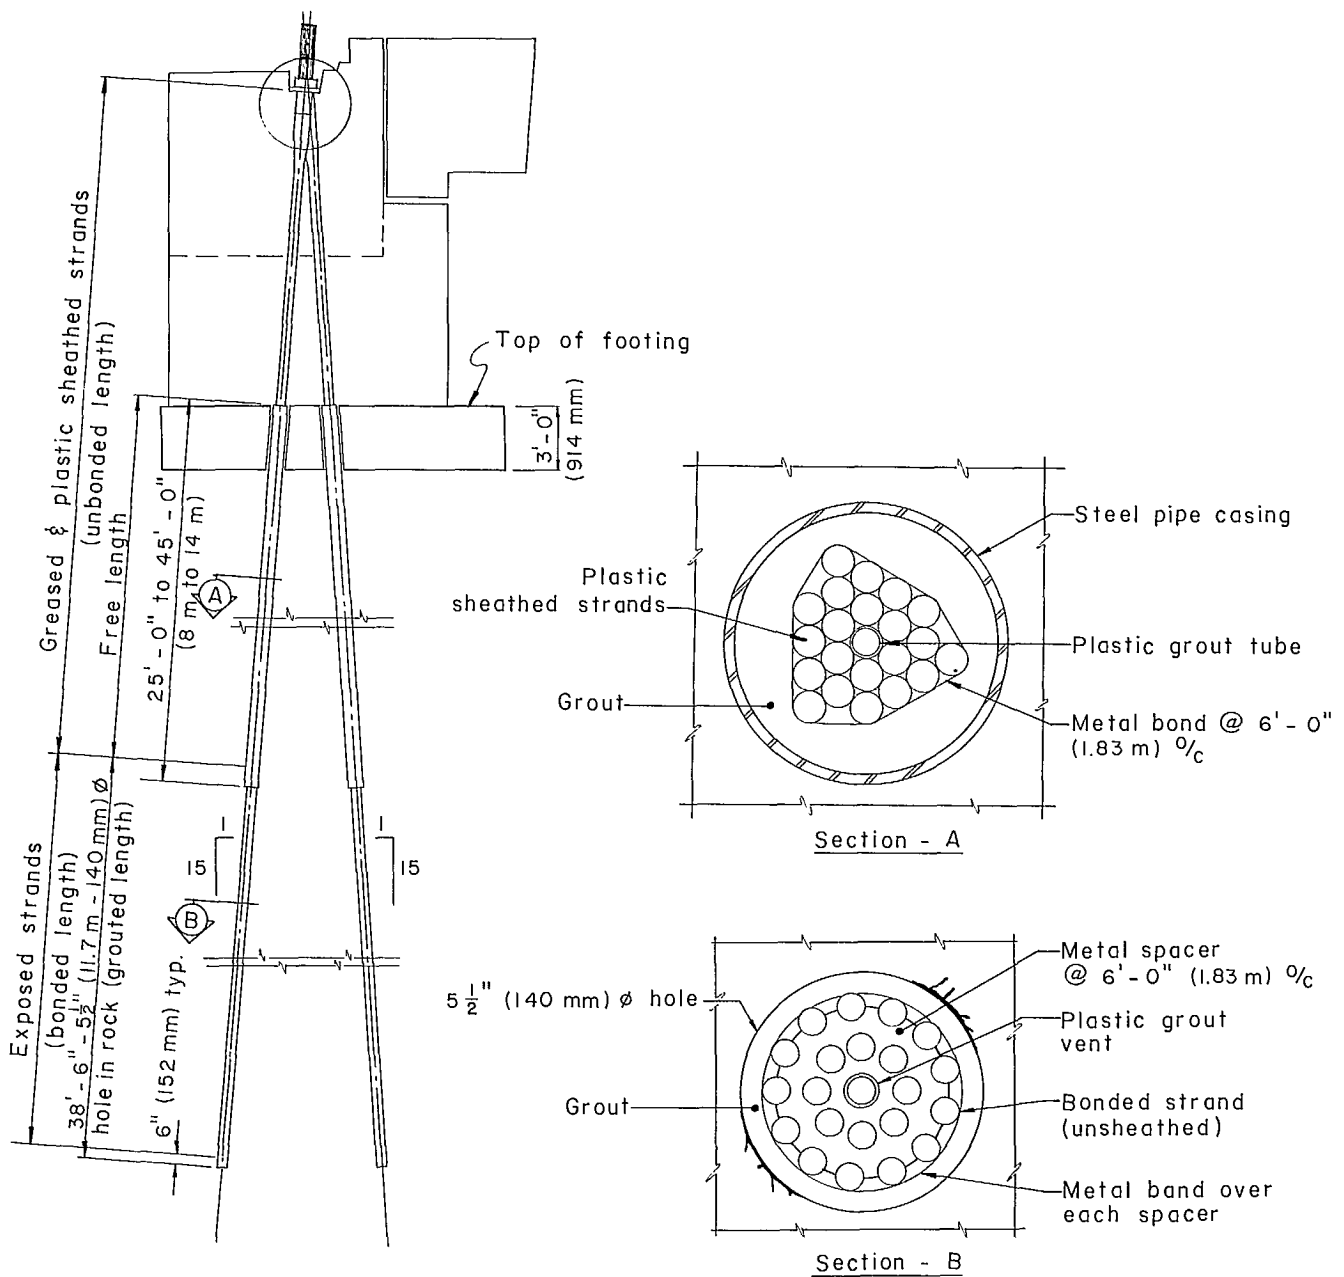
Rock anchors for bridge abutments (courtesy CONENCO Ltd.)
